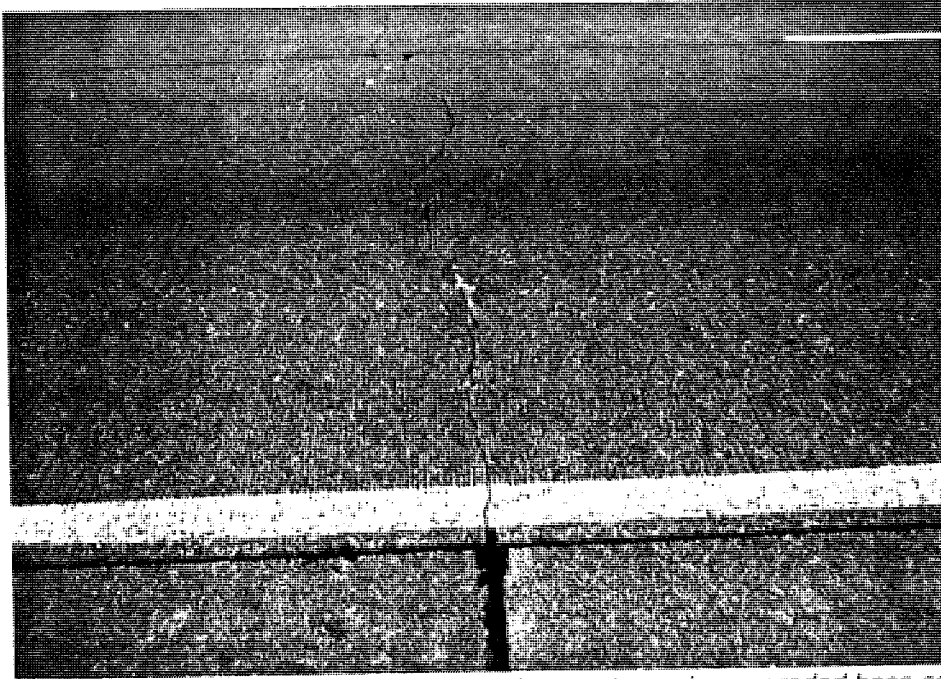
Typical crack in section MI1-4, recycled concrete on dense-graded base course.
